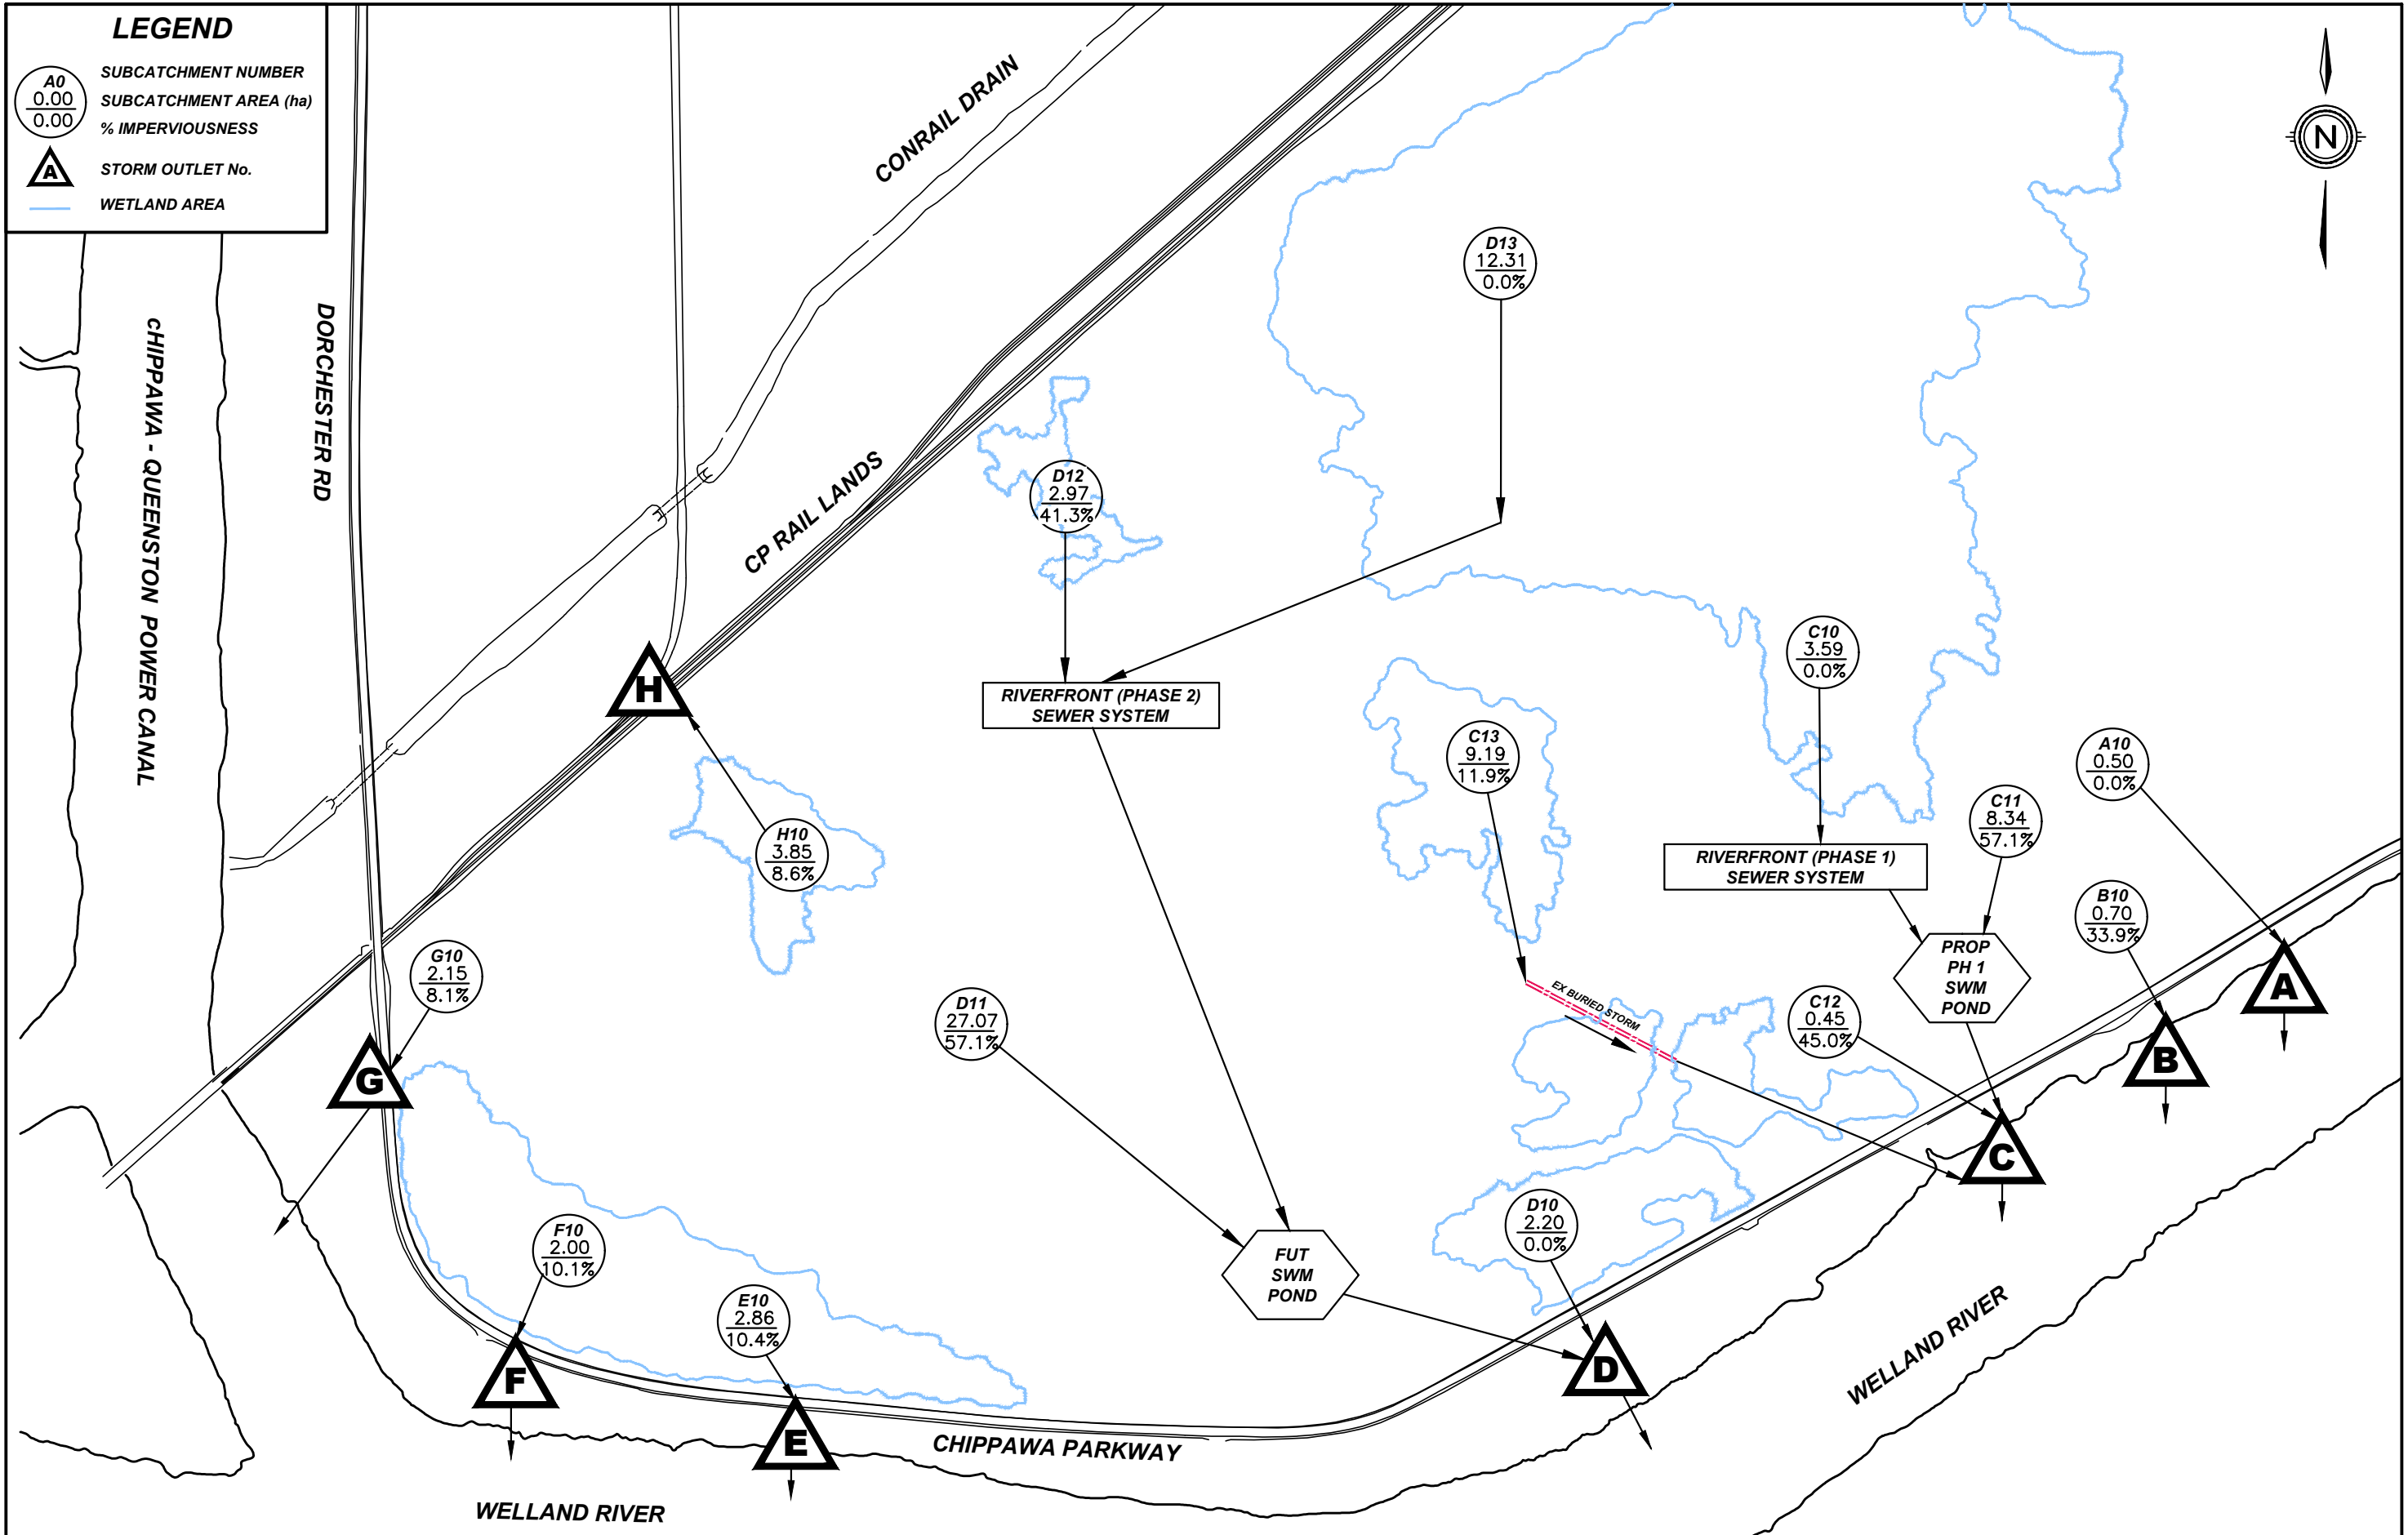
Schematic of Ultimate Storm Drainage Area Plan
